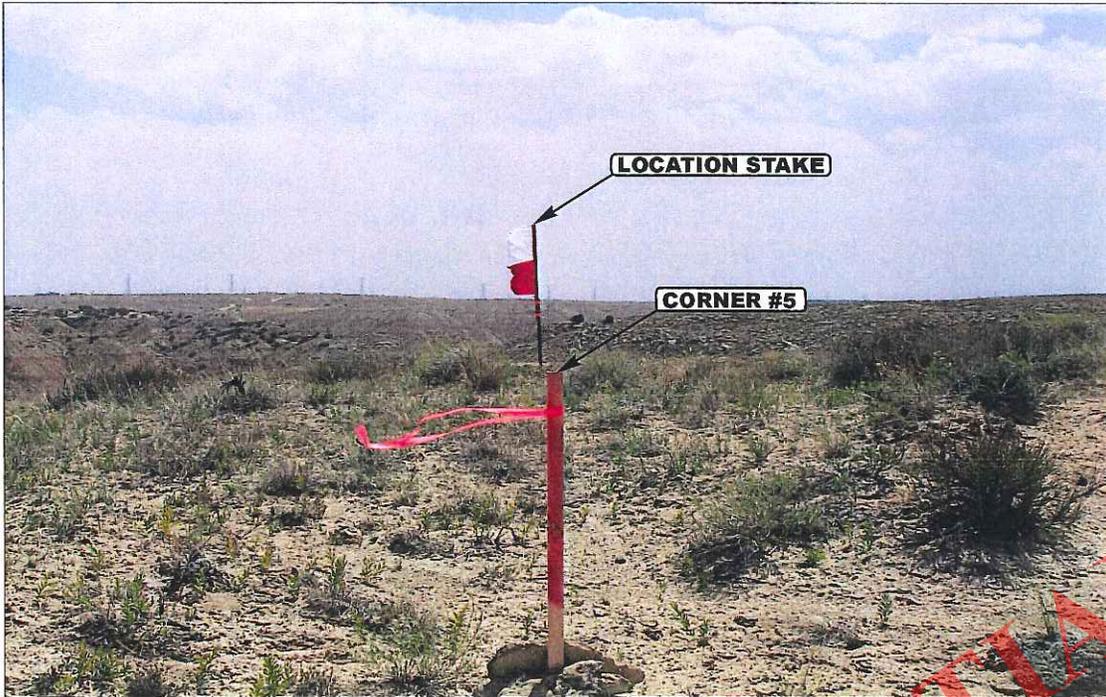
PHOTO: VIEW FROM CORNER #5 TO LOCATION STAKE
